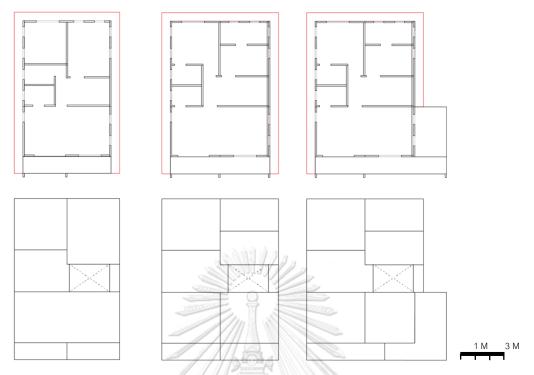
The overhang extension on the second-floor slabs of the integrated into the precast concrete floor slabs.
